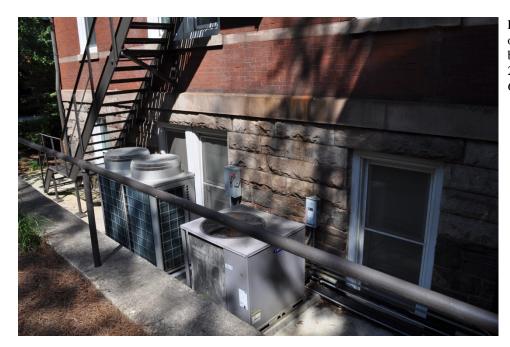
Detail of west elevation at basement level, 2011. *Photo, Beth Grashof.
